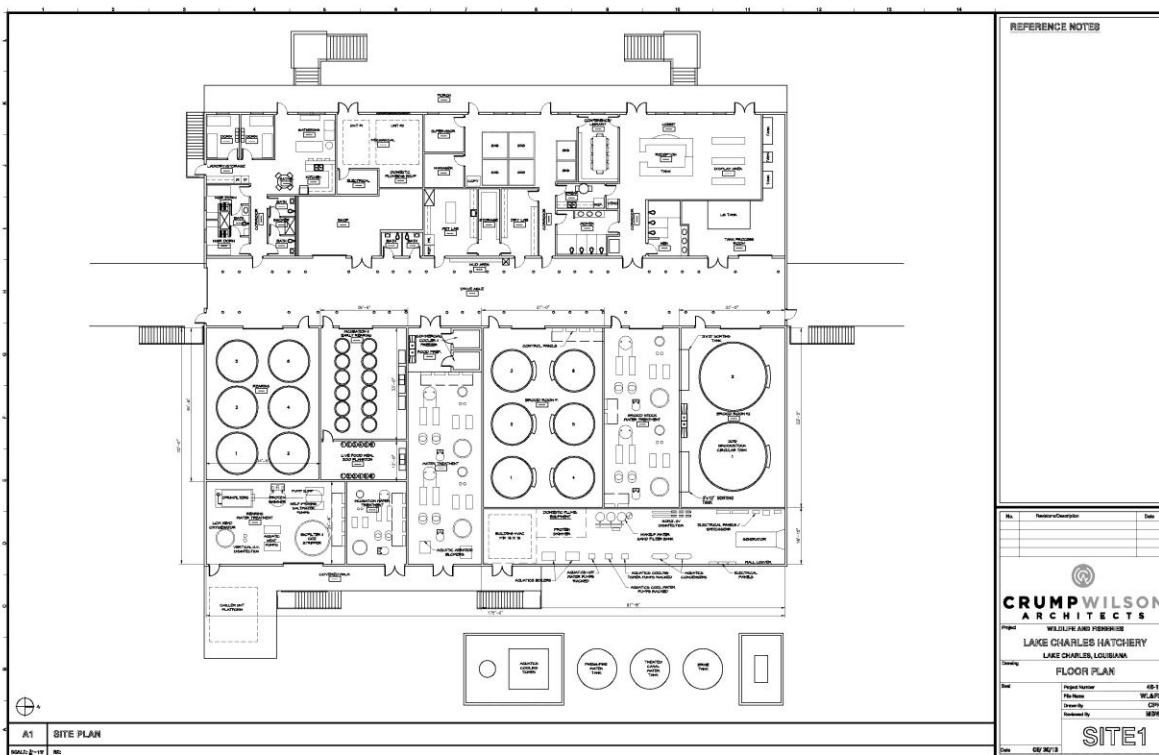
Proposed floor plan for Calcasieu Parish multi-purpose building.
